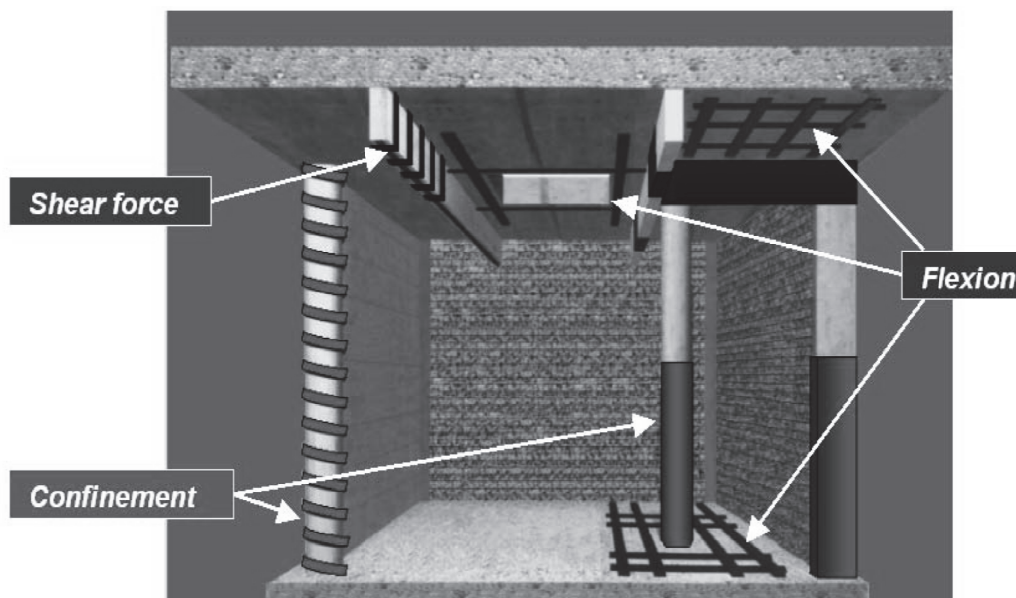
Typical FRP Application Site as Strengthening Materials of RC Structural Elements
